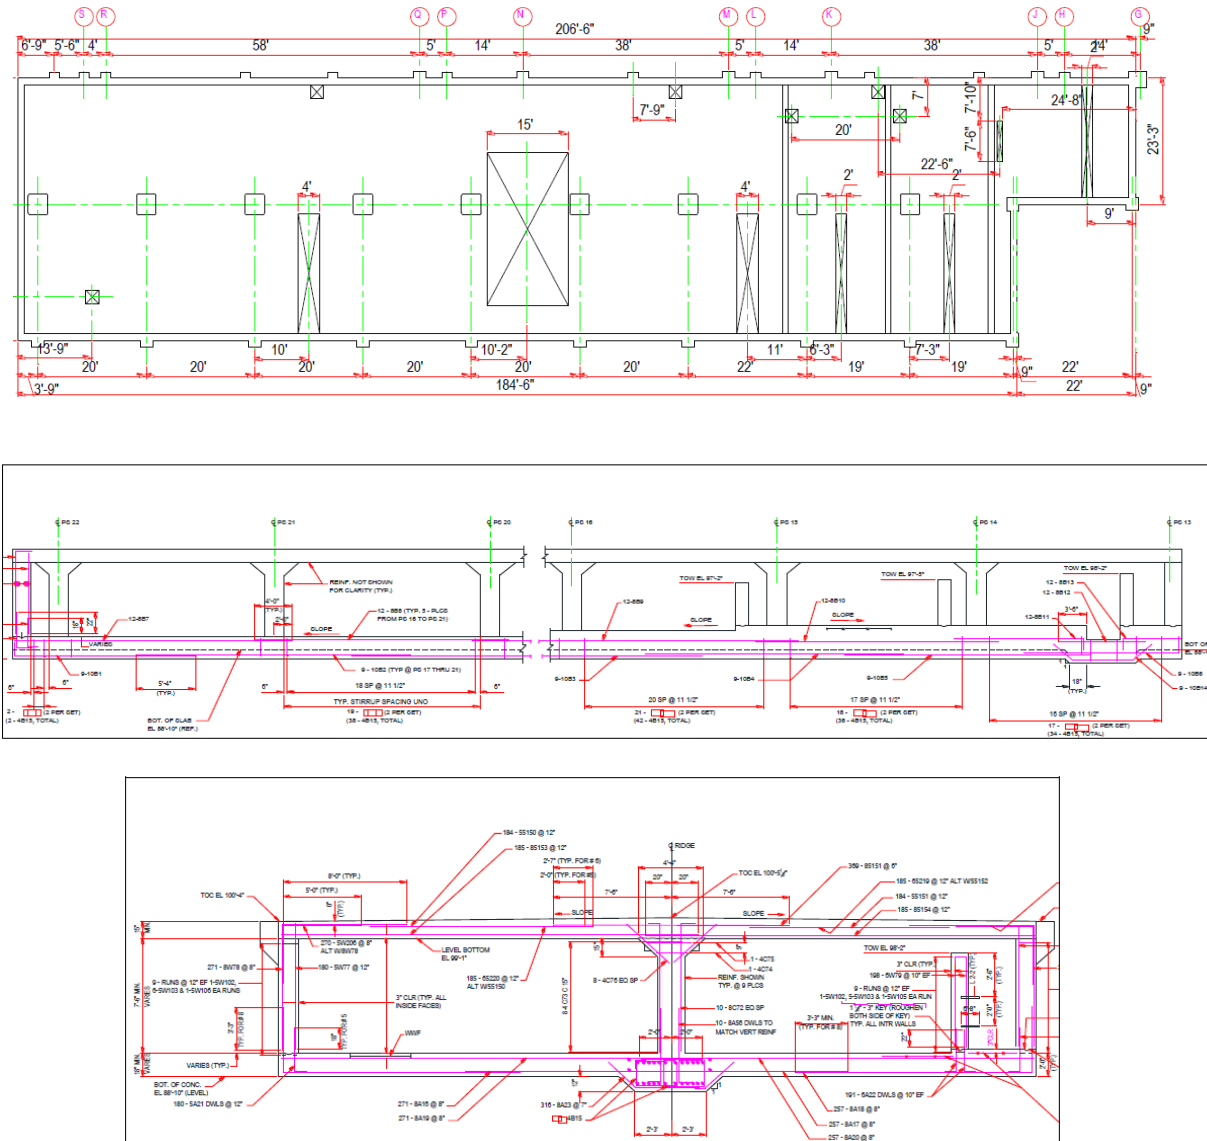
Typical Plan view, longitudinal and transverse sections of the SF structure.
